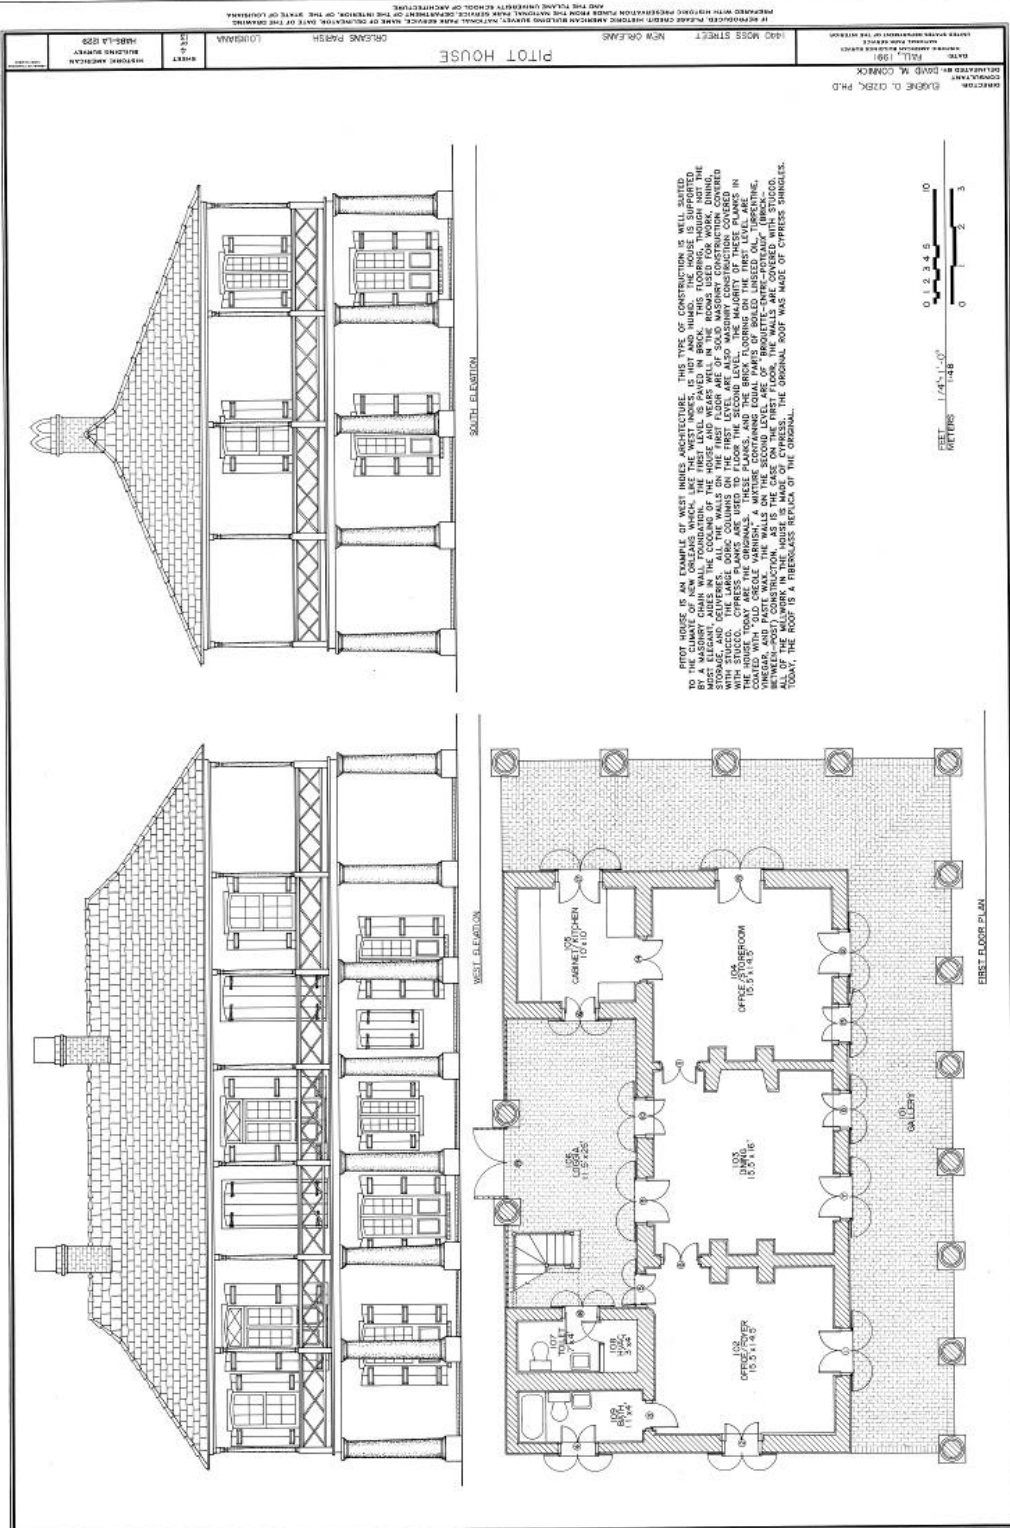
Ground Floor Plan; West and South Elevations. Source HABS.
